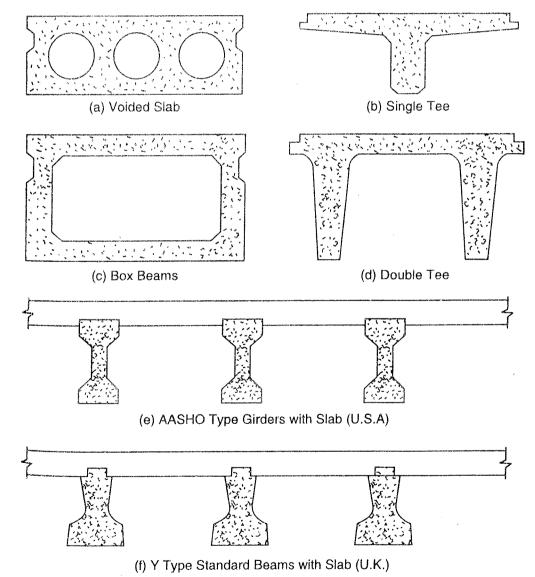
Typical Cross Sections of Pretensioned Prestressed Concrete Bridge Decks.
